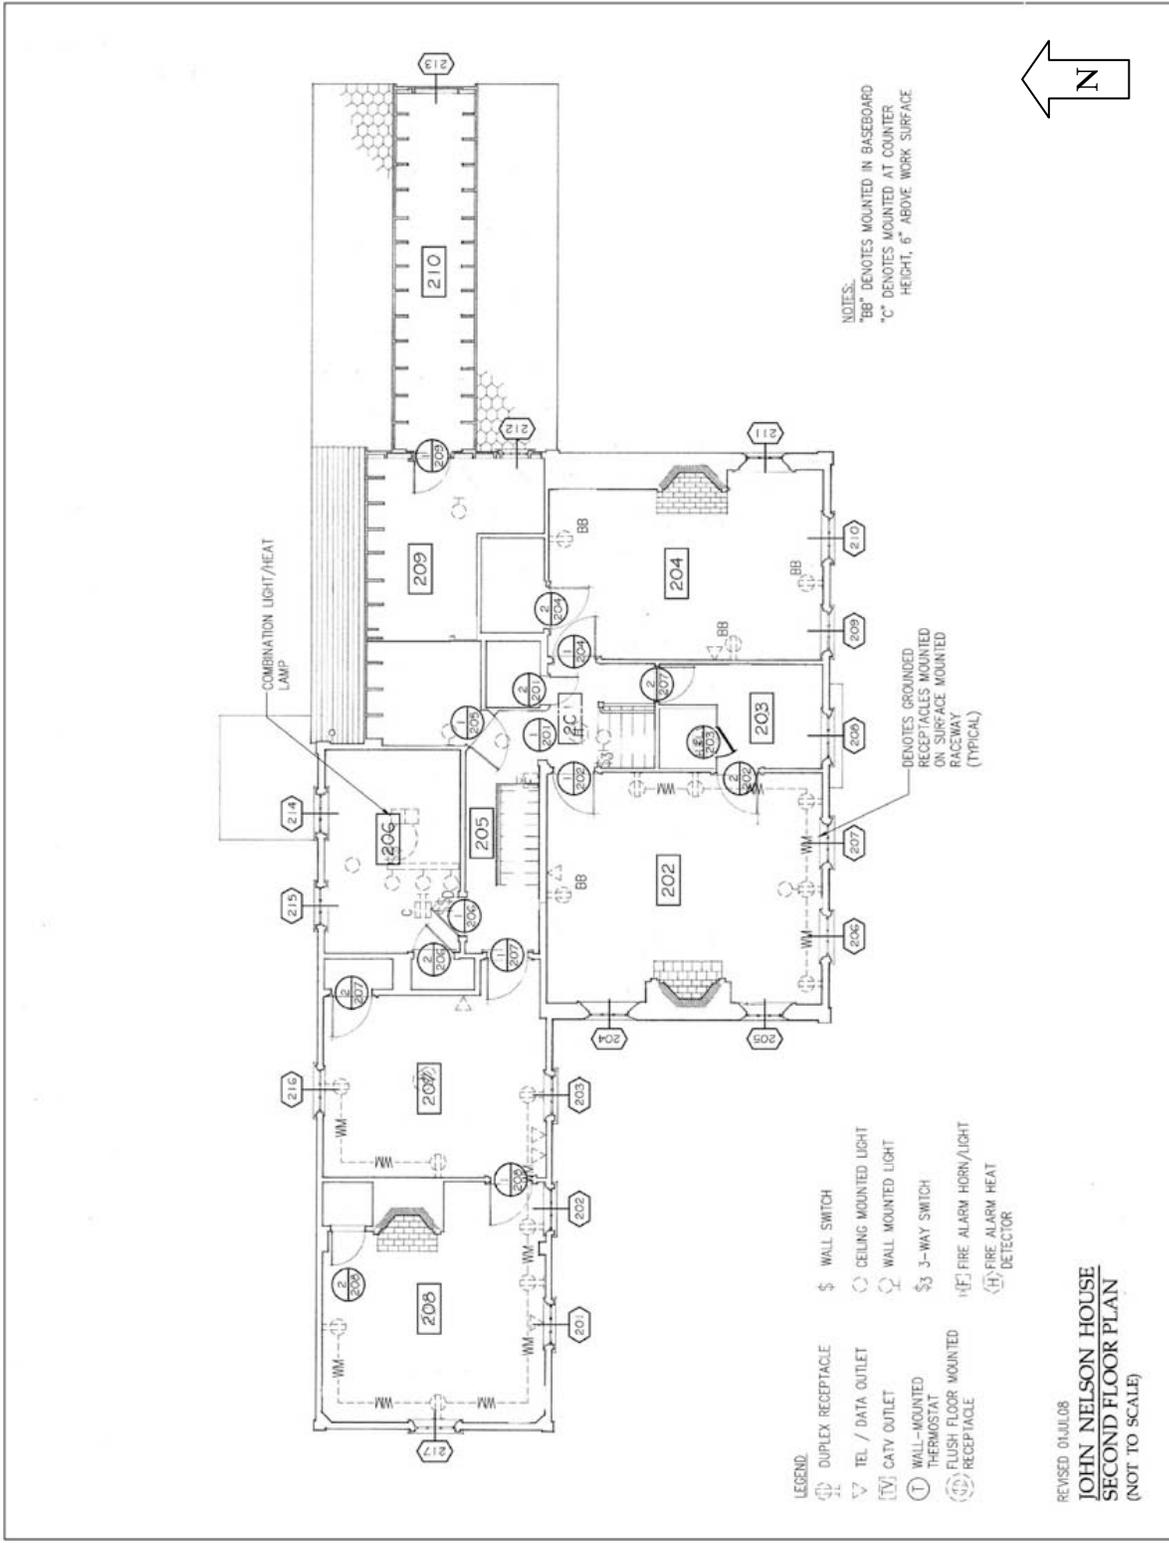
John Nelson House, second floor plan with room, doorway, window, and utilities key. Copied from HSA, 207, not to scale.
